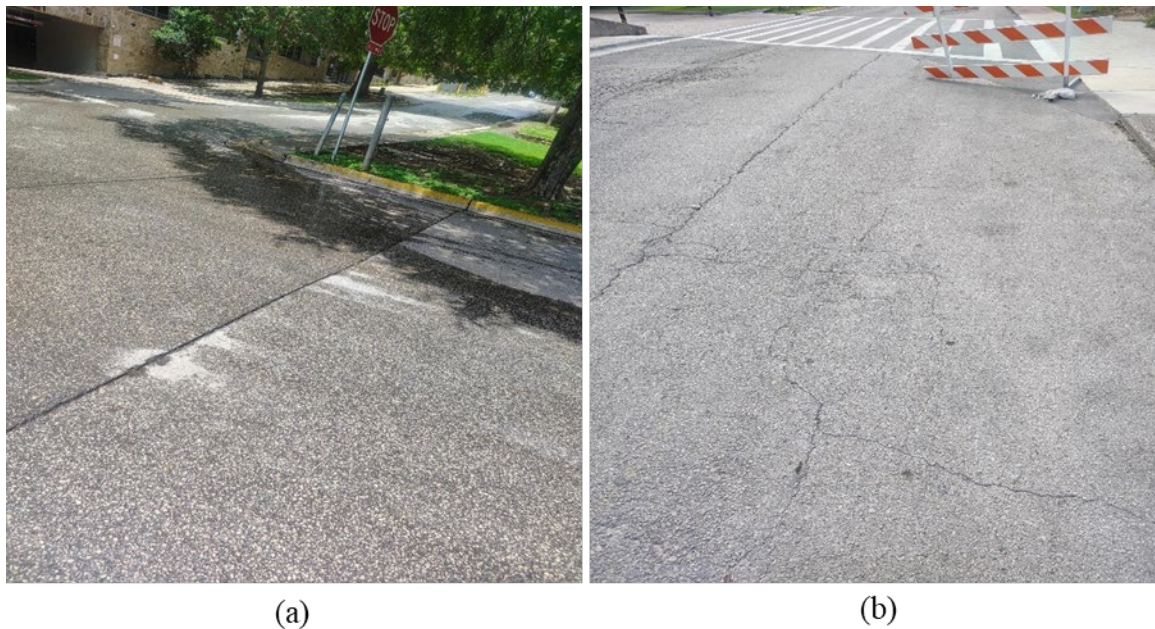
Non-distress objects on flexible pavement surfaces: (a) asphalt joints; (b) lane longitudinal cracking.
